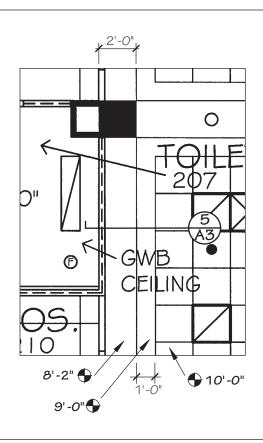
Sketch two sections, 4-A2 and 5-A3, as referenced on the partial reflected ceiling plans A and B. Sketch the details at a scale of  $1^{1/2}$  in = 1 ft 0 in (1:8) using the base sheet shown. Include all notes and dimensions that you feel would be needed to fully communicate the construction of the detail to the designer for approval and so that someone else could put in the other CAD details for this project. For this assignment you do not have to draw within the drawing module, although it is possible to include all the information in a single drawing module.
